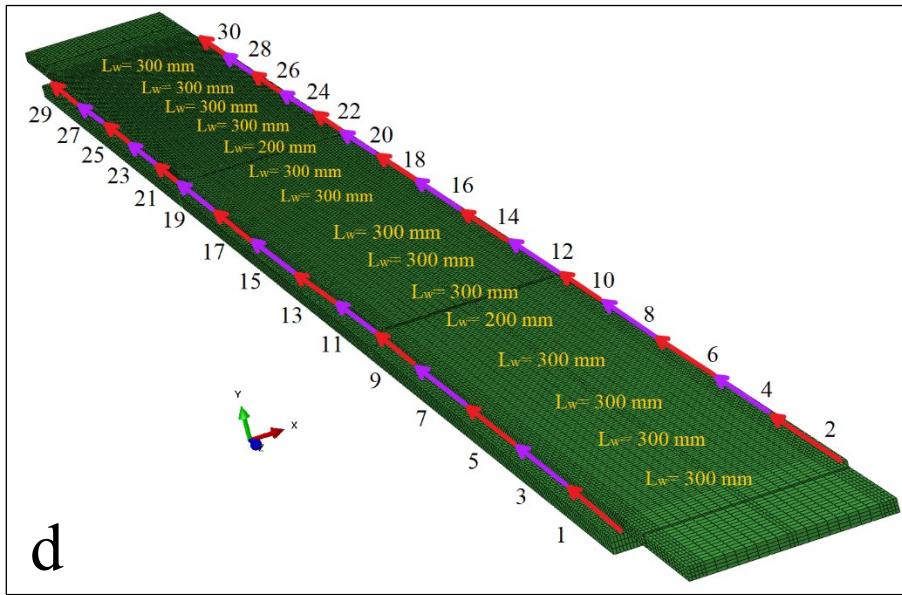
Welding partitions for adding the reinforcing plate to the bottom flange of the steel I-beam
